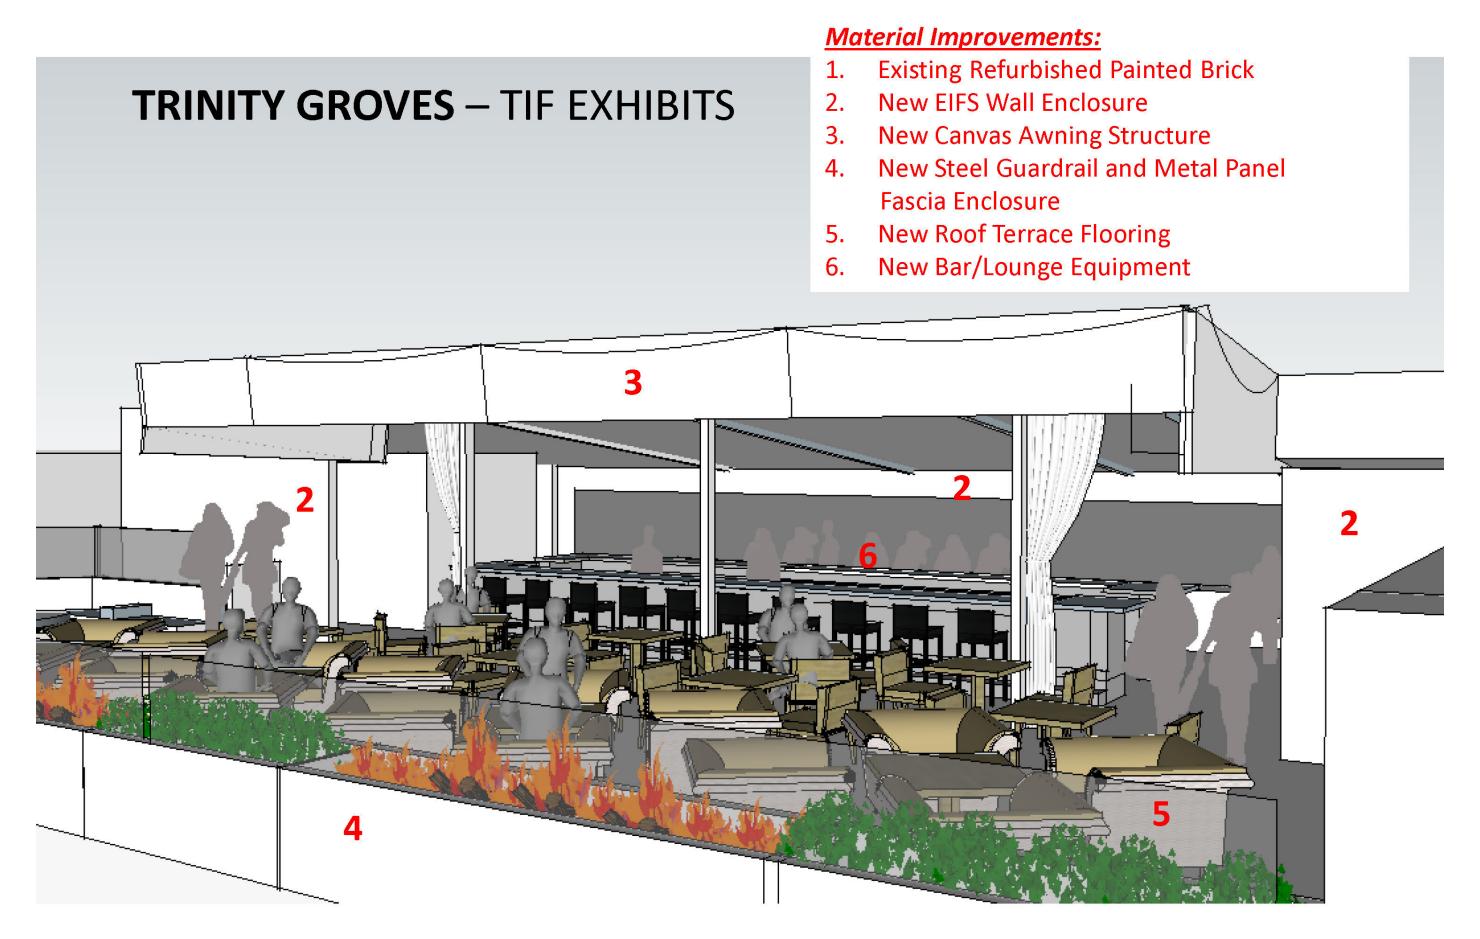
Exhibit C – Proposed Phase 2 (New Rooftop Bar/Lounge)
